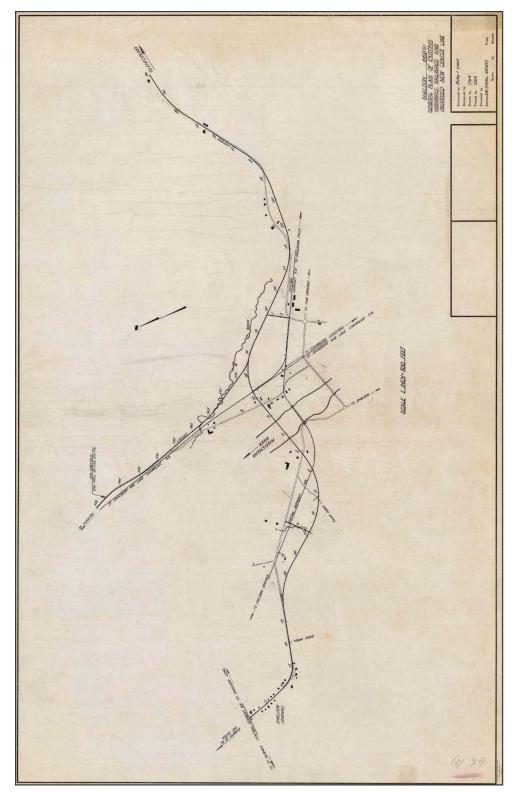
Site Plan of Sheldon Bridge over Missisquoi River (Vermont State Highway Board 1948)
